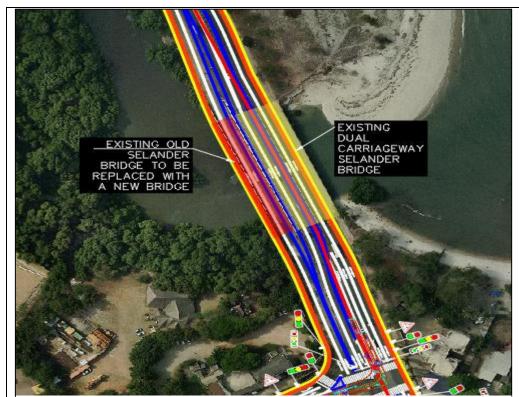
Geometric centreline for road section from km 1+600 to km 3+300.
